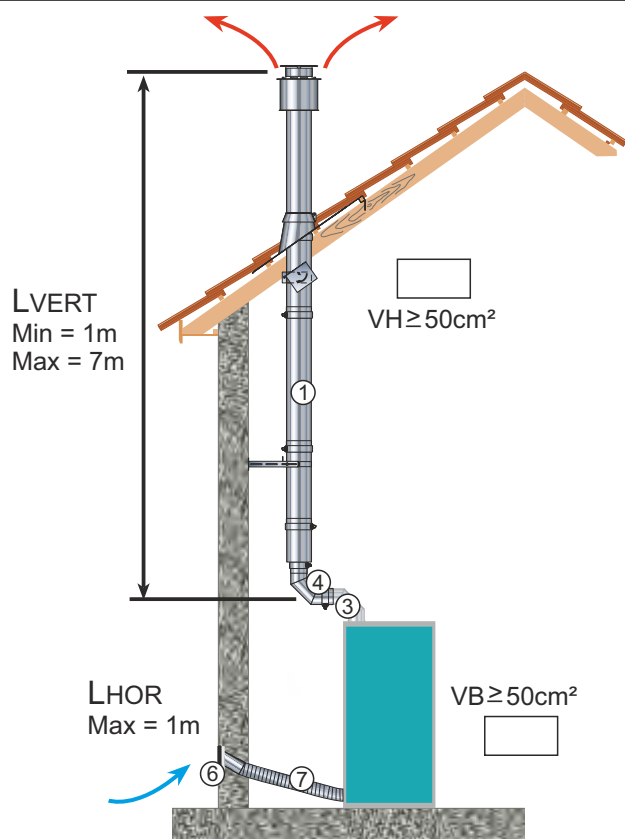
Fresh air from the facade - wall grille, chimney inside the boiler room
